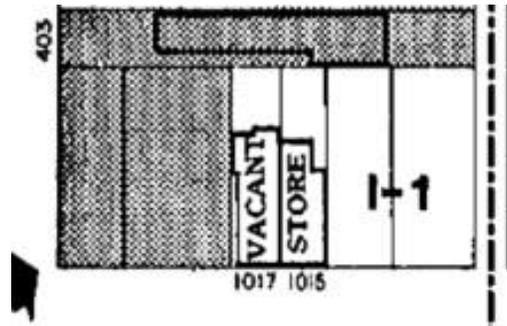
1987 BZA site plan of property. Note the existing building outline completely enveloped by the addition.
